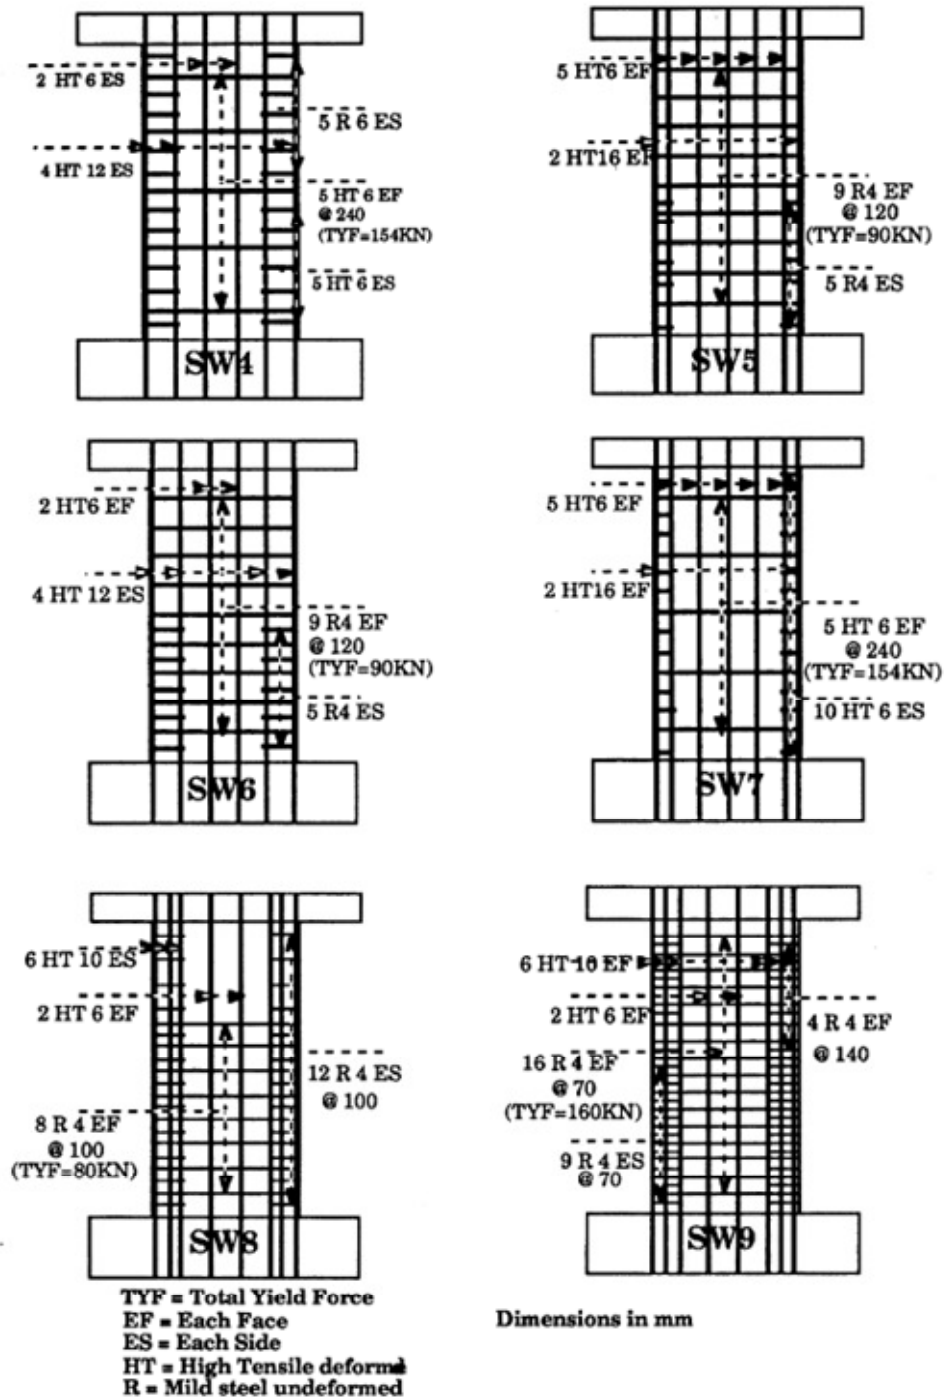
Reinforcement details of walls tested by Pilakoutas and Elnashai (1995)
